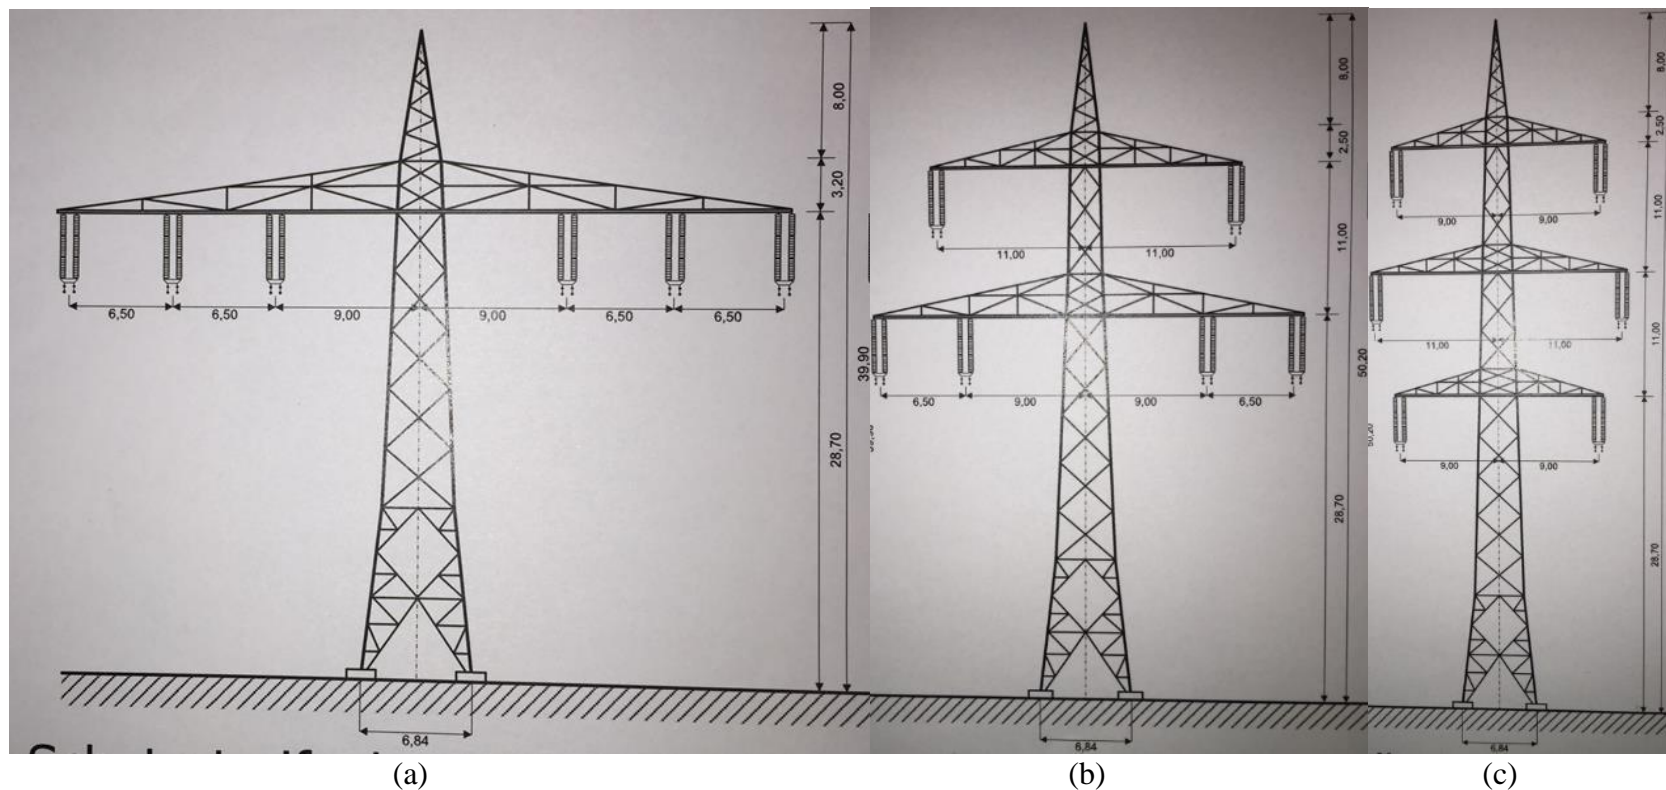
Standard tower dimensions for a 380-kV line: (a) Single Plane; (b) Danube; (c) Barrel
